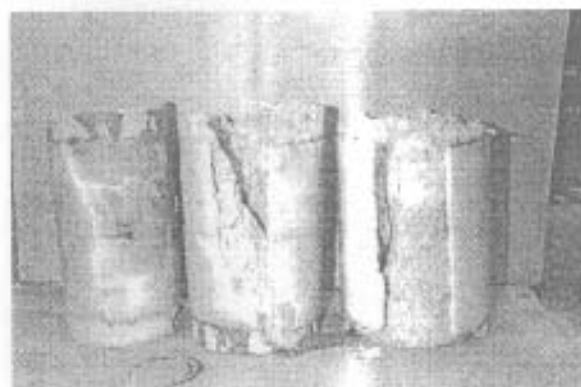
Failure modes of the E-glass/epoxy laminate wrapped concrete cylinder after compression test.
